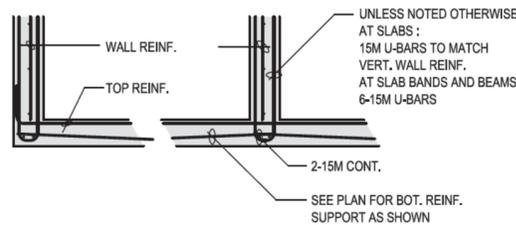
DETAIL OF HORIZONTAL REINFORCEMENT AT CORNERS
